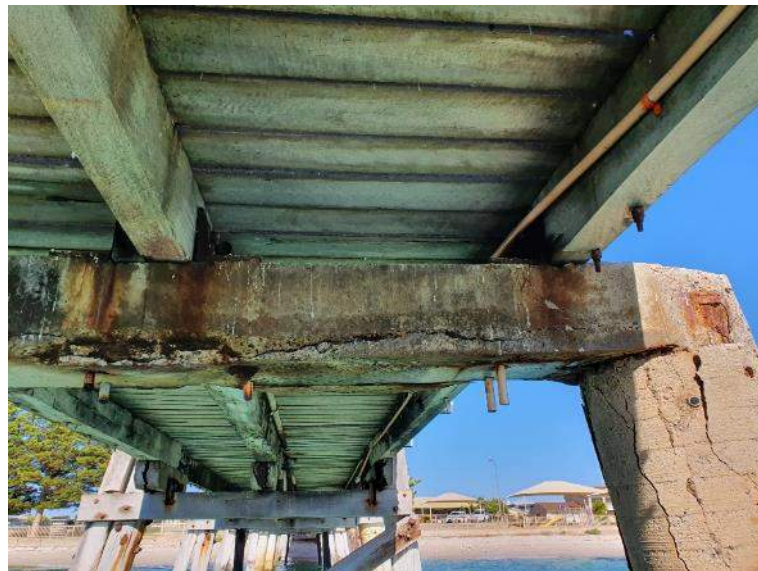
Typical Condition 6 Concrete Crosshead (Defect: Cracking & Spalling)
